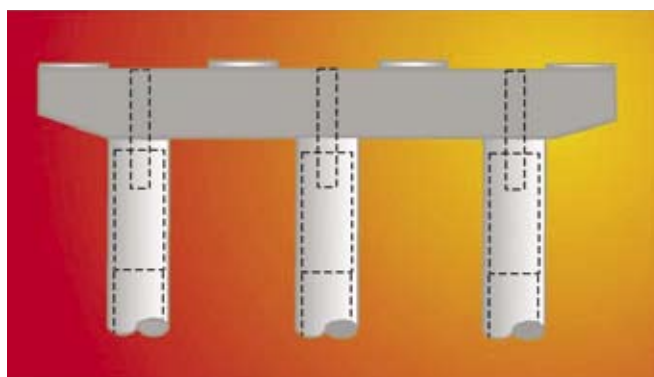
Schematic shows positioning of steel pipe in the pile-to-bent cap connection.
